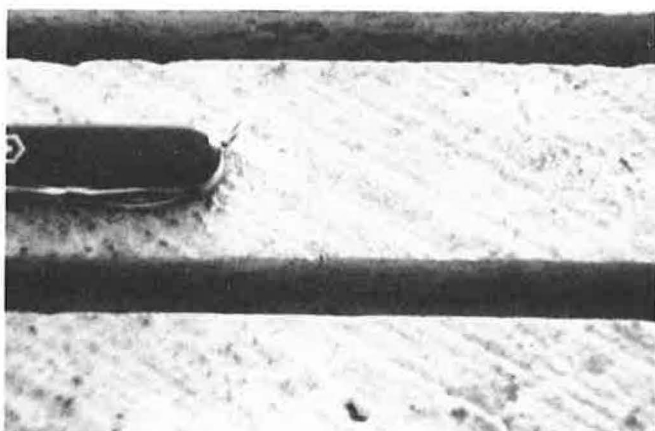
Typical minor drying shrinkage/thermal crack.
